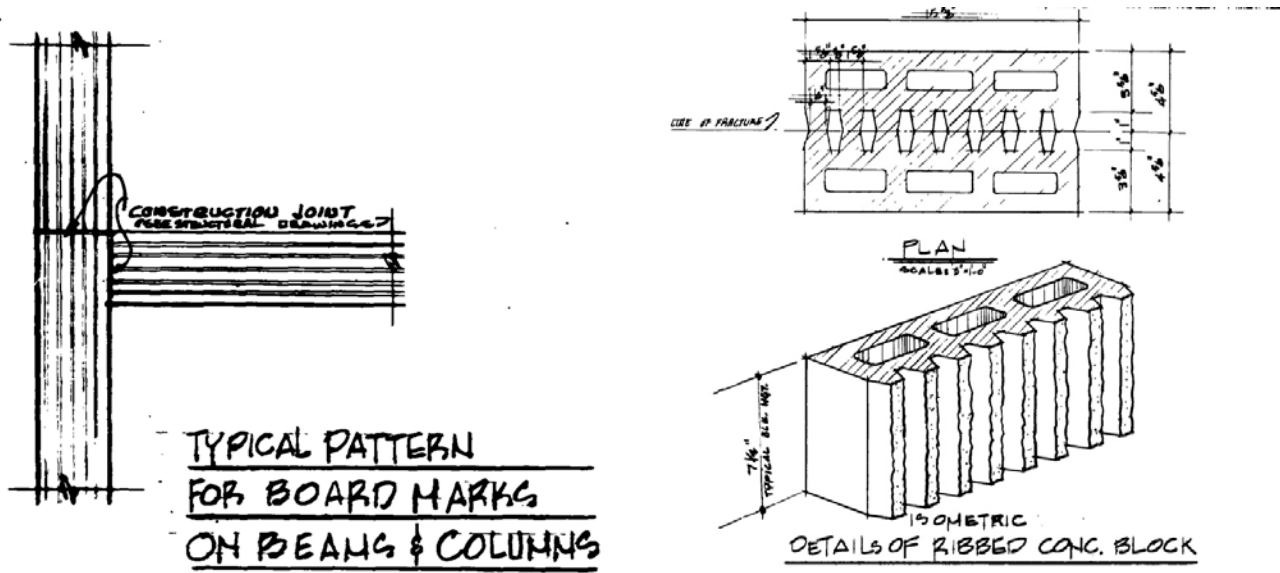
Architectural details of the board-formed exposed concrete frame and the split-ribbed concrete block used at the building by Paul Rudolph. (NYCHA)
